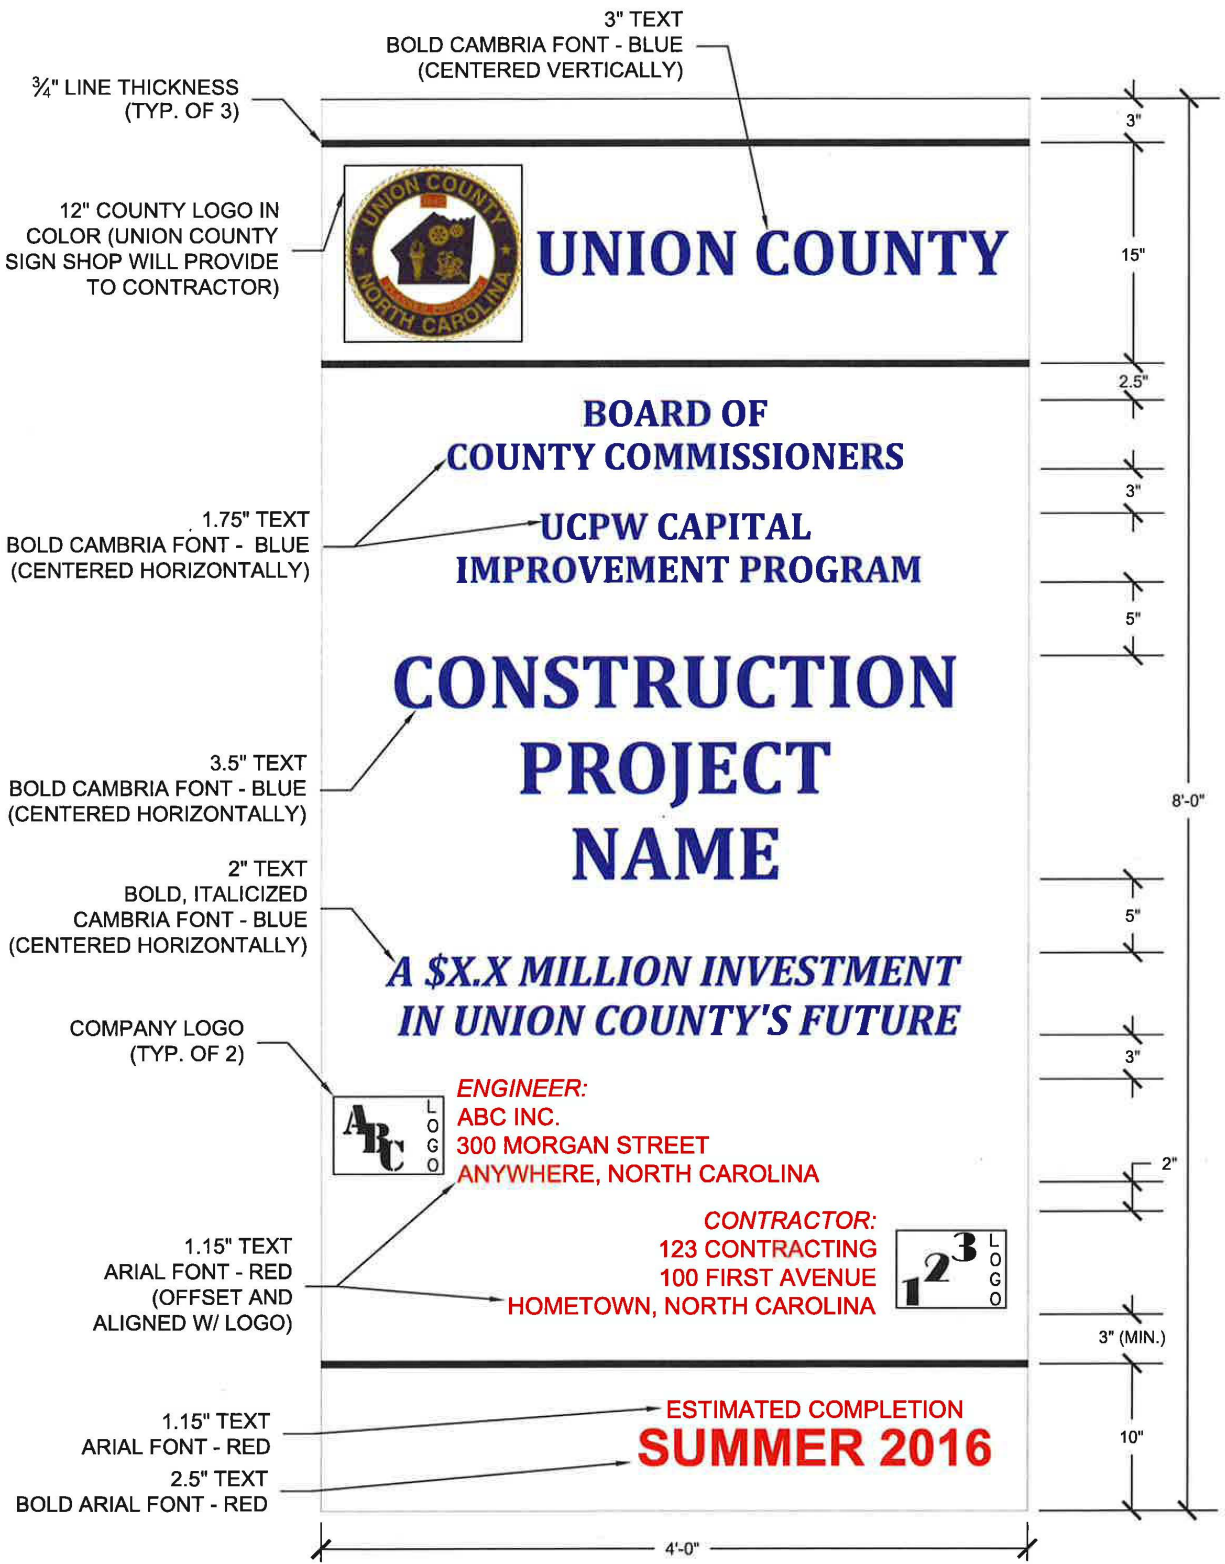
EXHIBIT A - STANDARD CONSTRUCTION PROJECT SIGN
